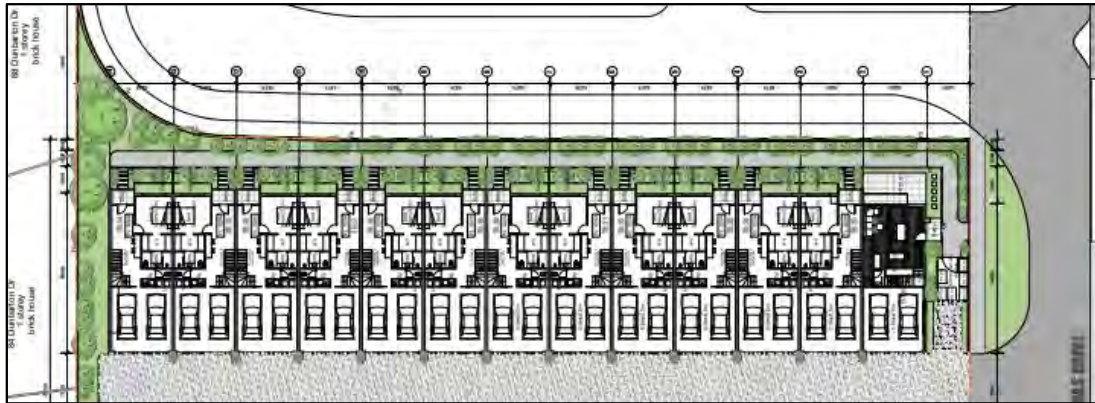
Ground floor of northern flank of townhouses (Townhouses 14-26)
